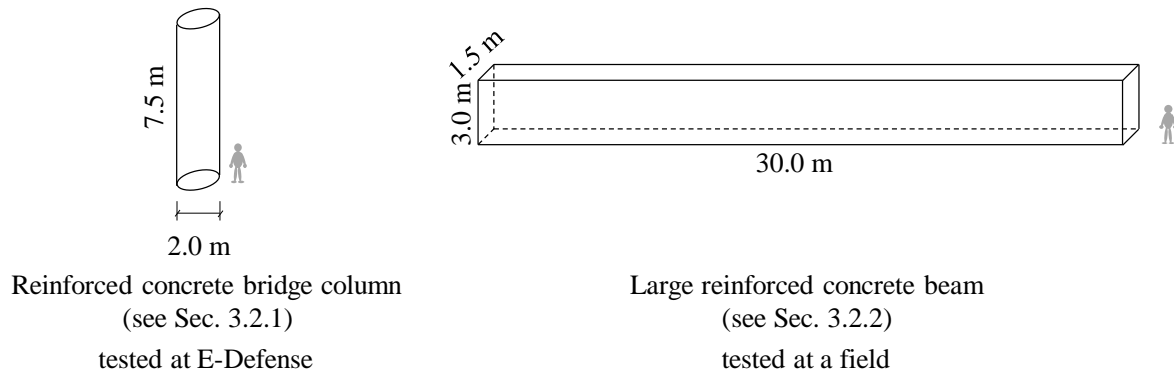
Outline of specimens referred in Sec. 3.2 (Category II)
